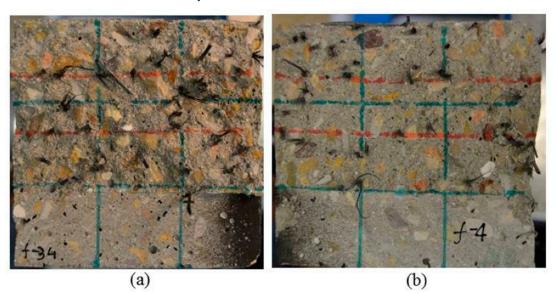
Fracture surfaces generated: (a) VCC6-60;(b) SCC6-60.
